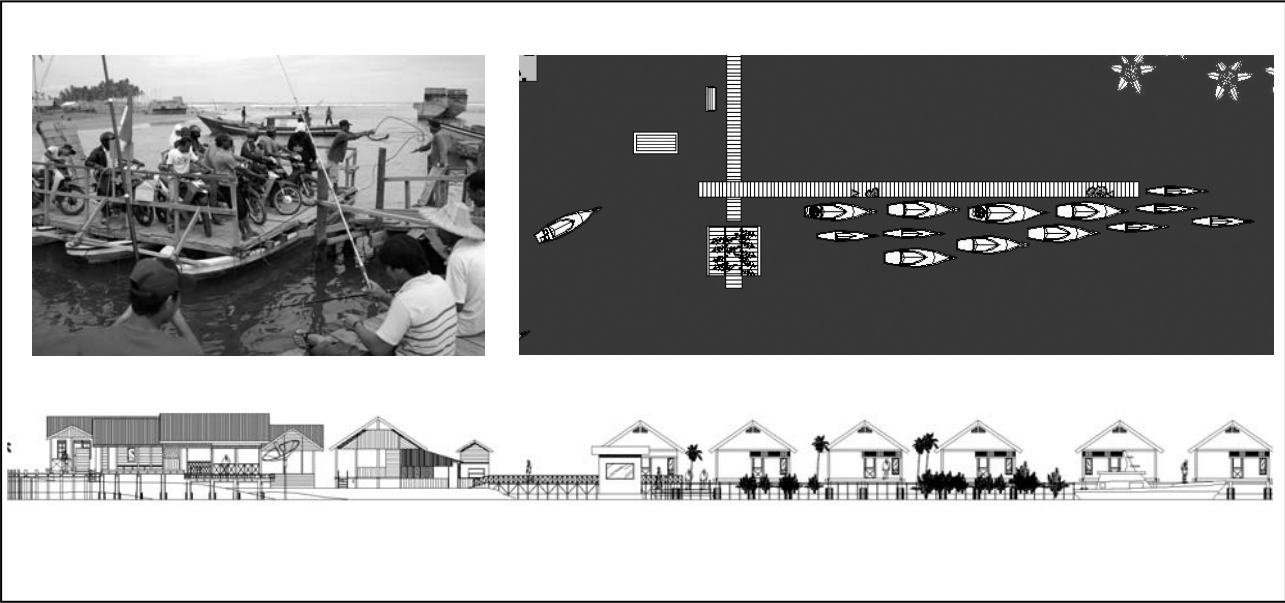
The Wooden Pier and Its Surrounding Area [RM III]
